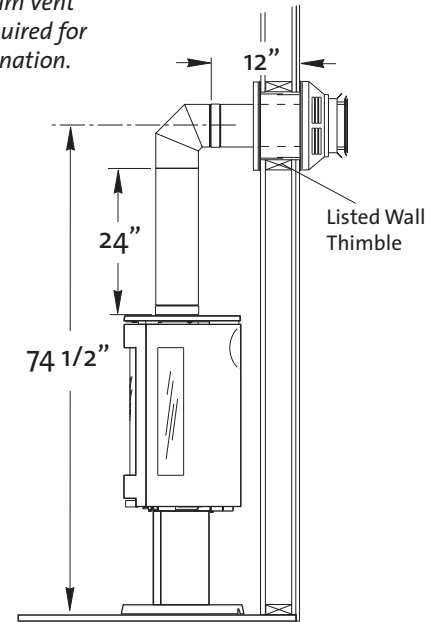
Minimum vent pipe sections required for a 14" Snorkel termination.
